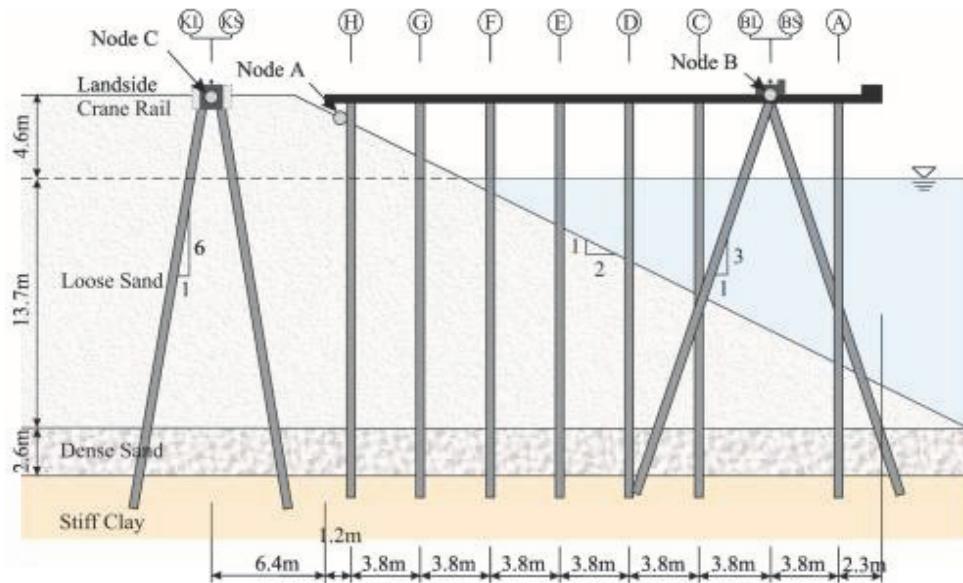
Example cross-section of pile-supported wharf configuration (Shafieezadeh et. al., 2011a).
